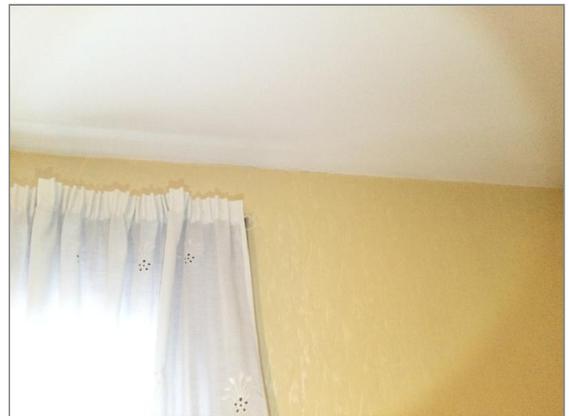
Perimeter cracking was noted to the ceiling in the second left hand bedroom
